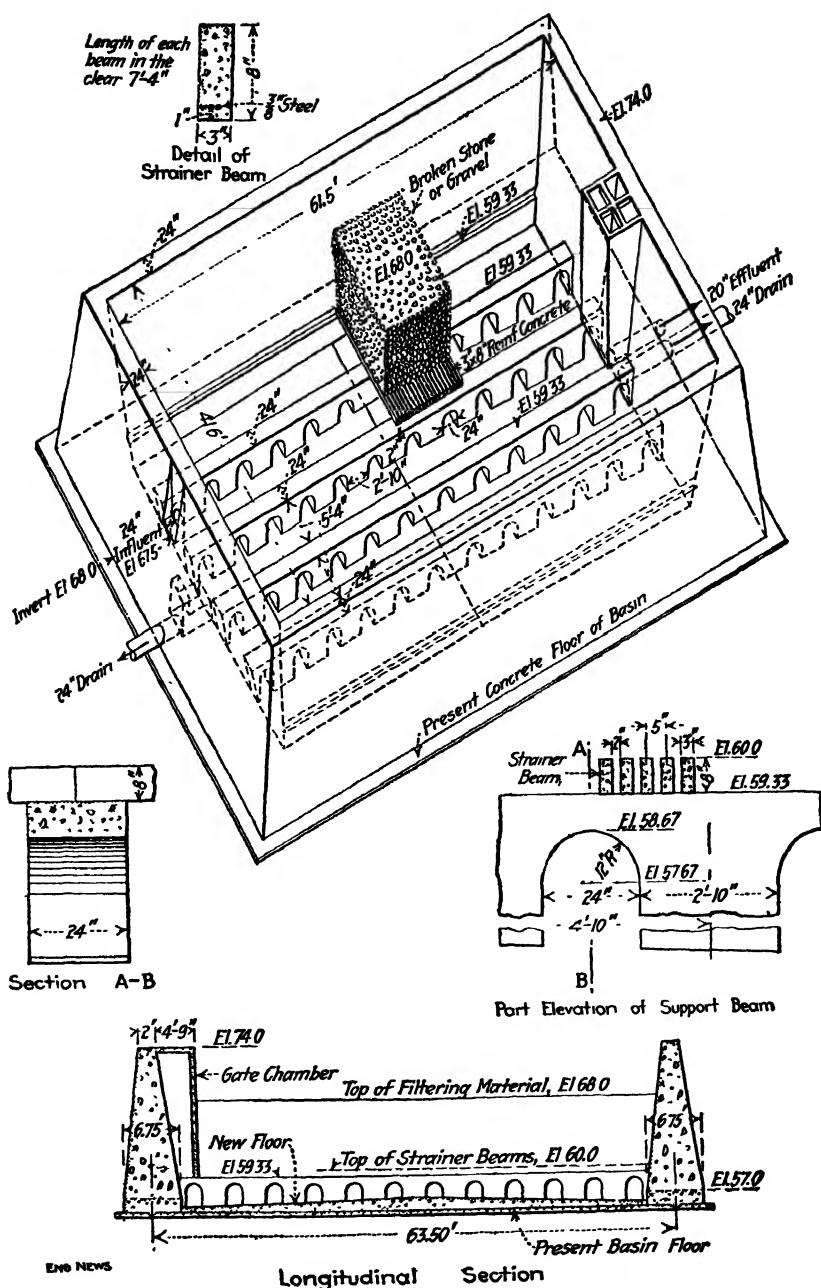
Isometric view of typical unit and some details of contact baffles, Pittsburgh, Pa.
